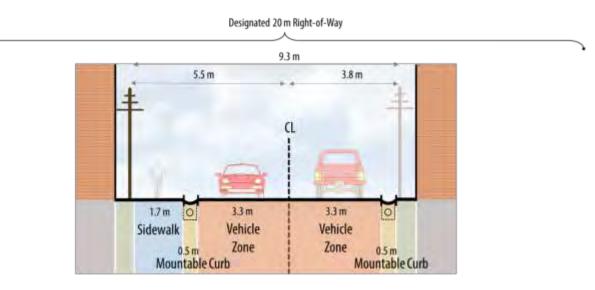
9.3 m Platform Semi-Rural Cross-Section with Sidewalk for Belfountain Village (Shaws Creek Rd. to Mississauga Rd. / Old Main St.)
